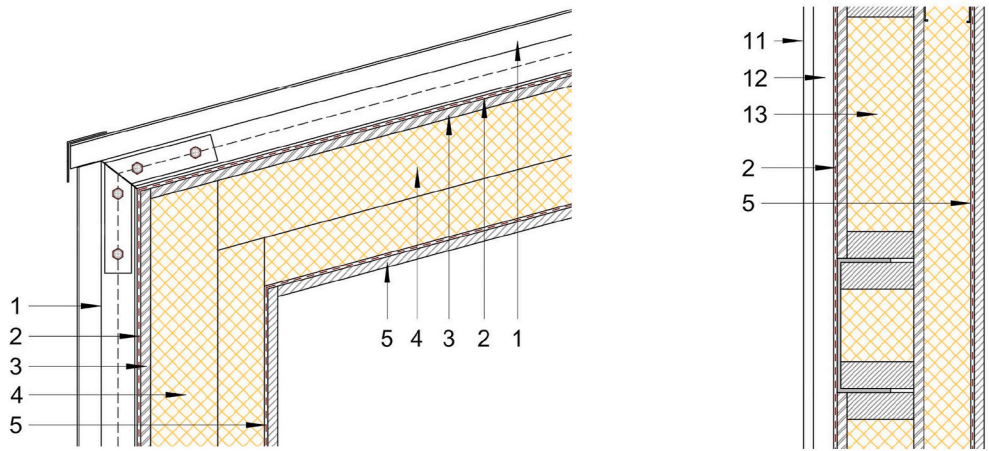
Section of the modular load-bearing walls and roofs (left) and the facade section (right).
